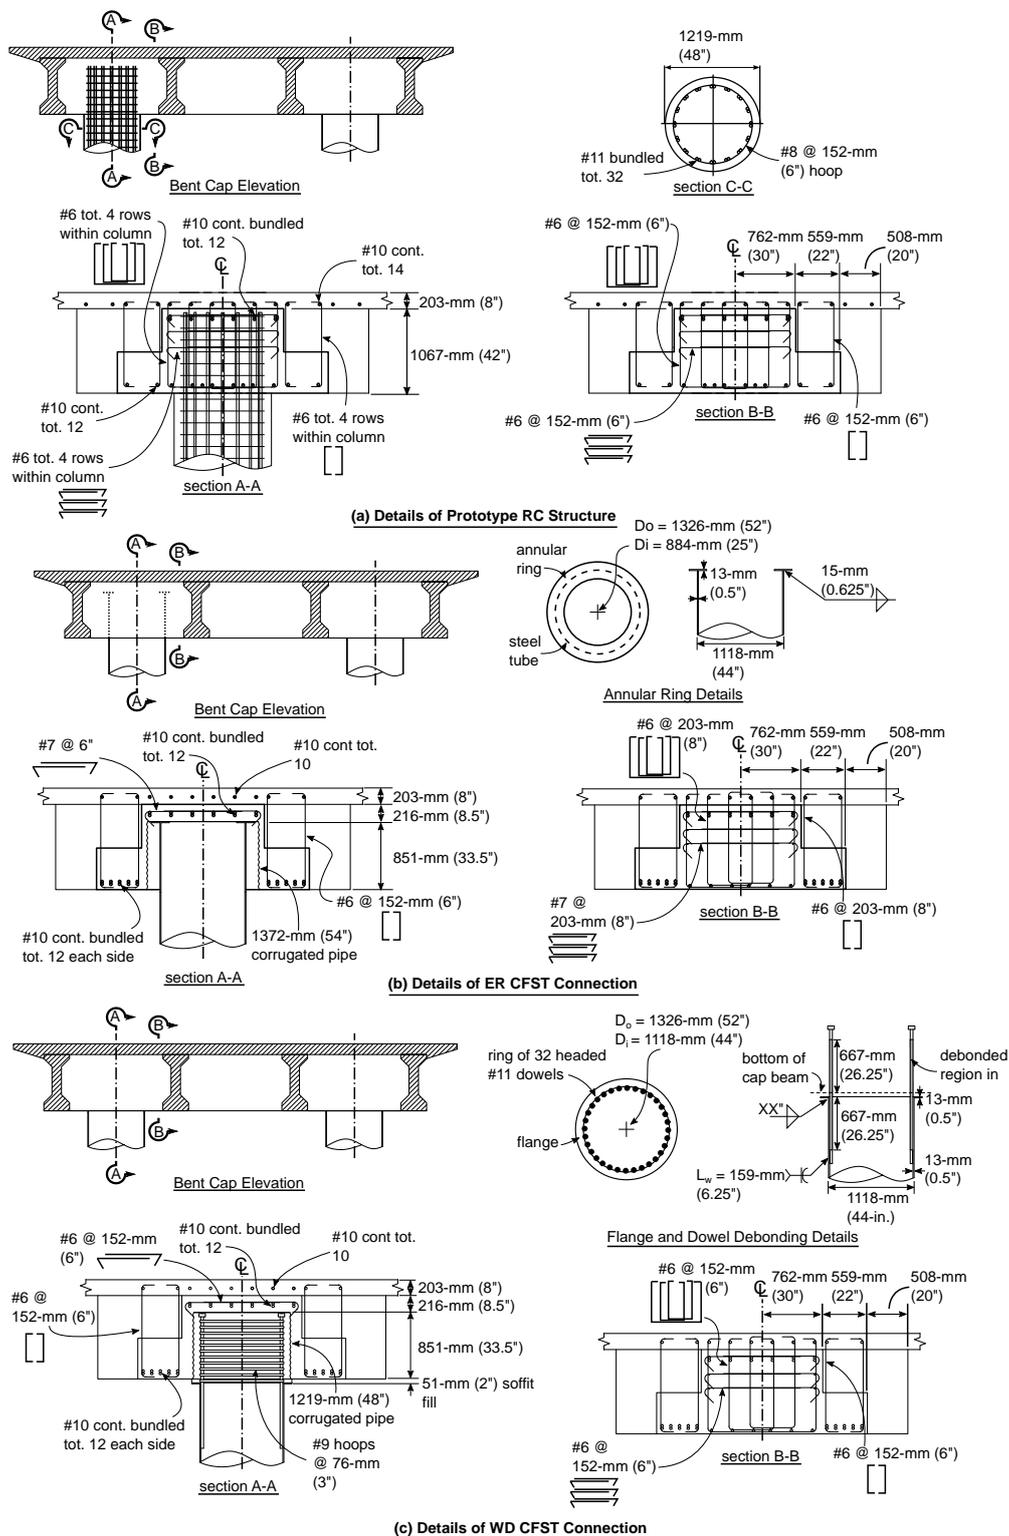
Details of RC Prototype Structure and Redesigned CFST Structure with ER Connection
